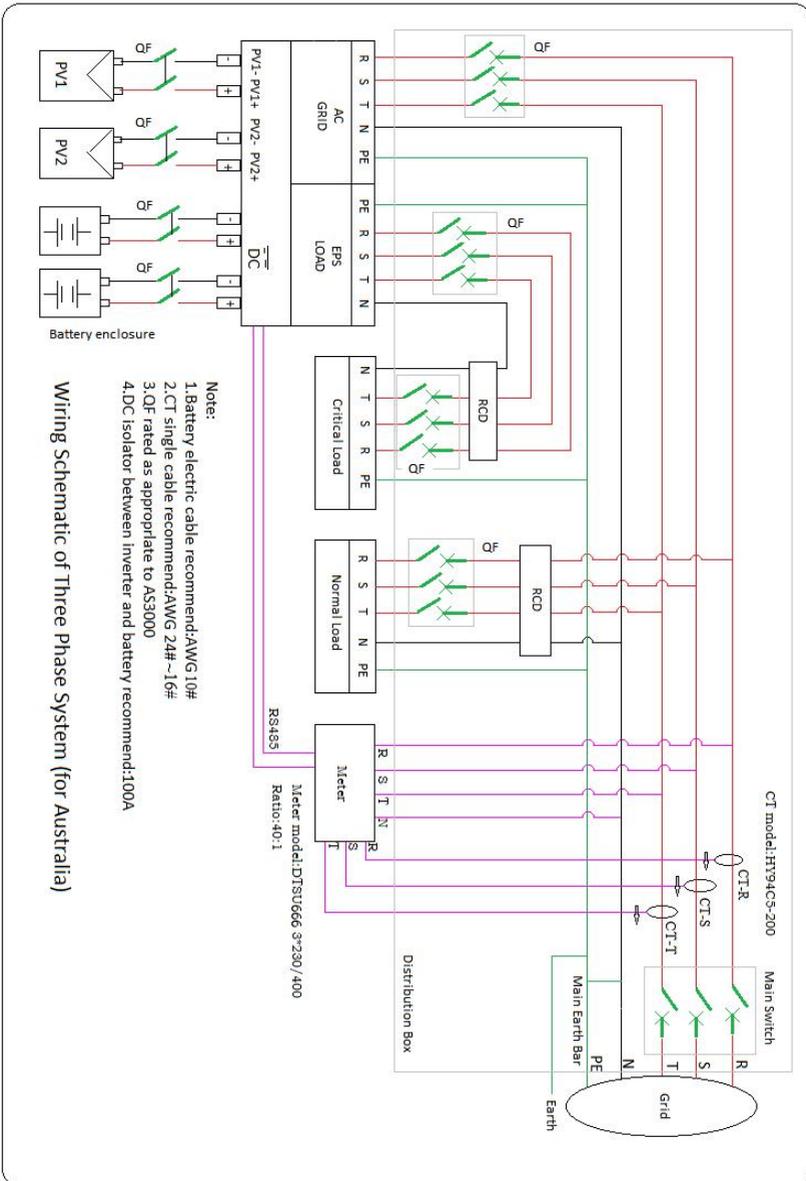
Electrical connections (Plan B: Meter + CT)
